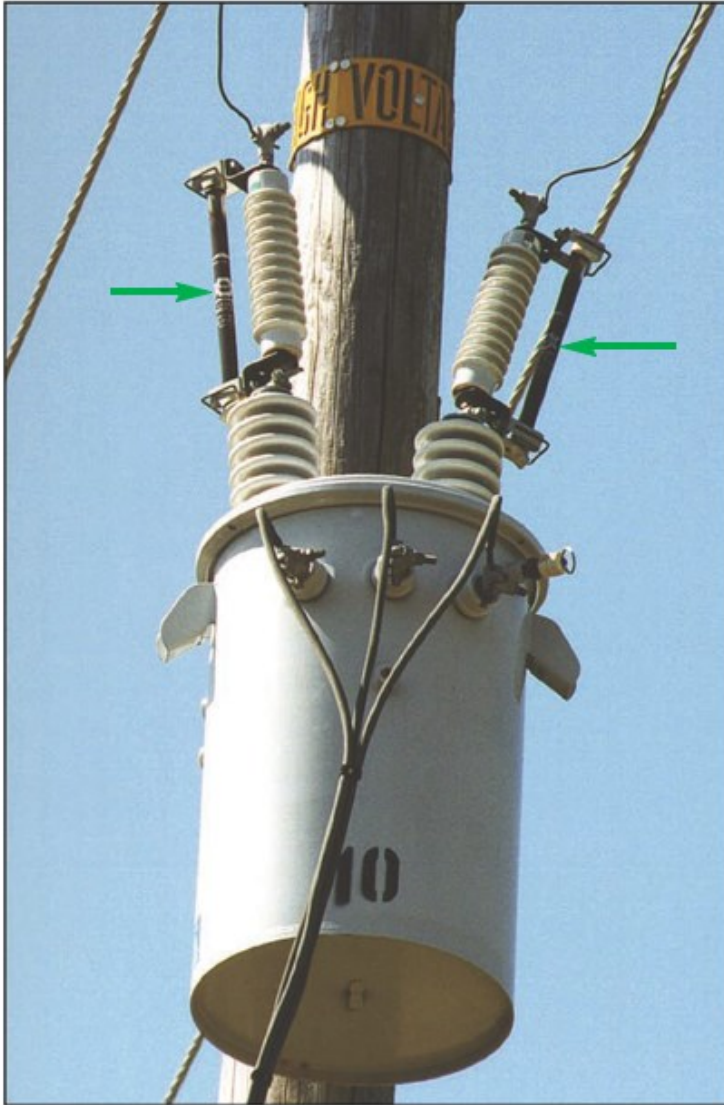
Over Head Conventional Transformer with Bushing Mounted Cutout and Liquid Filled Fuse
